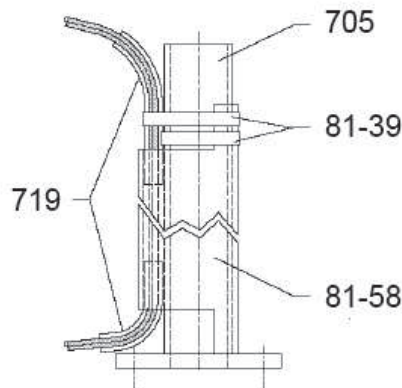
Routing the power cable with cable conduit along the vent pipe
